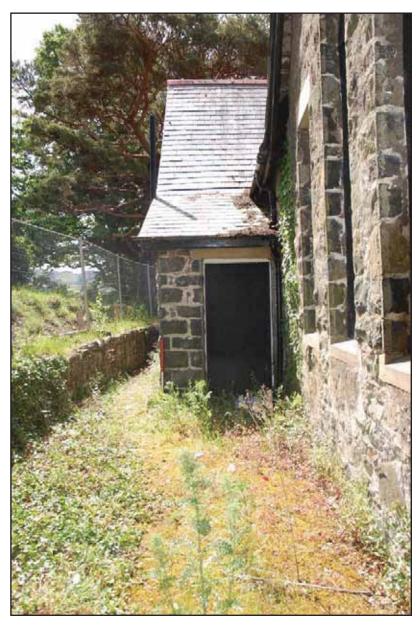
School Bank Road south building east facing elevation - ground floor entrance to room G01 detail. Scale: 1.0m.
